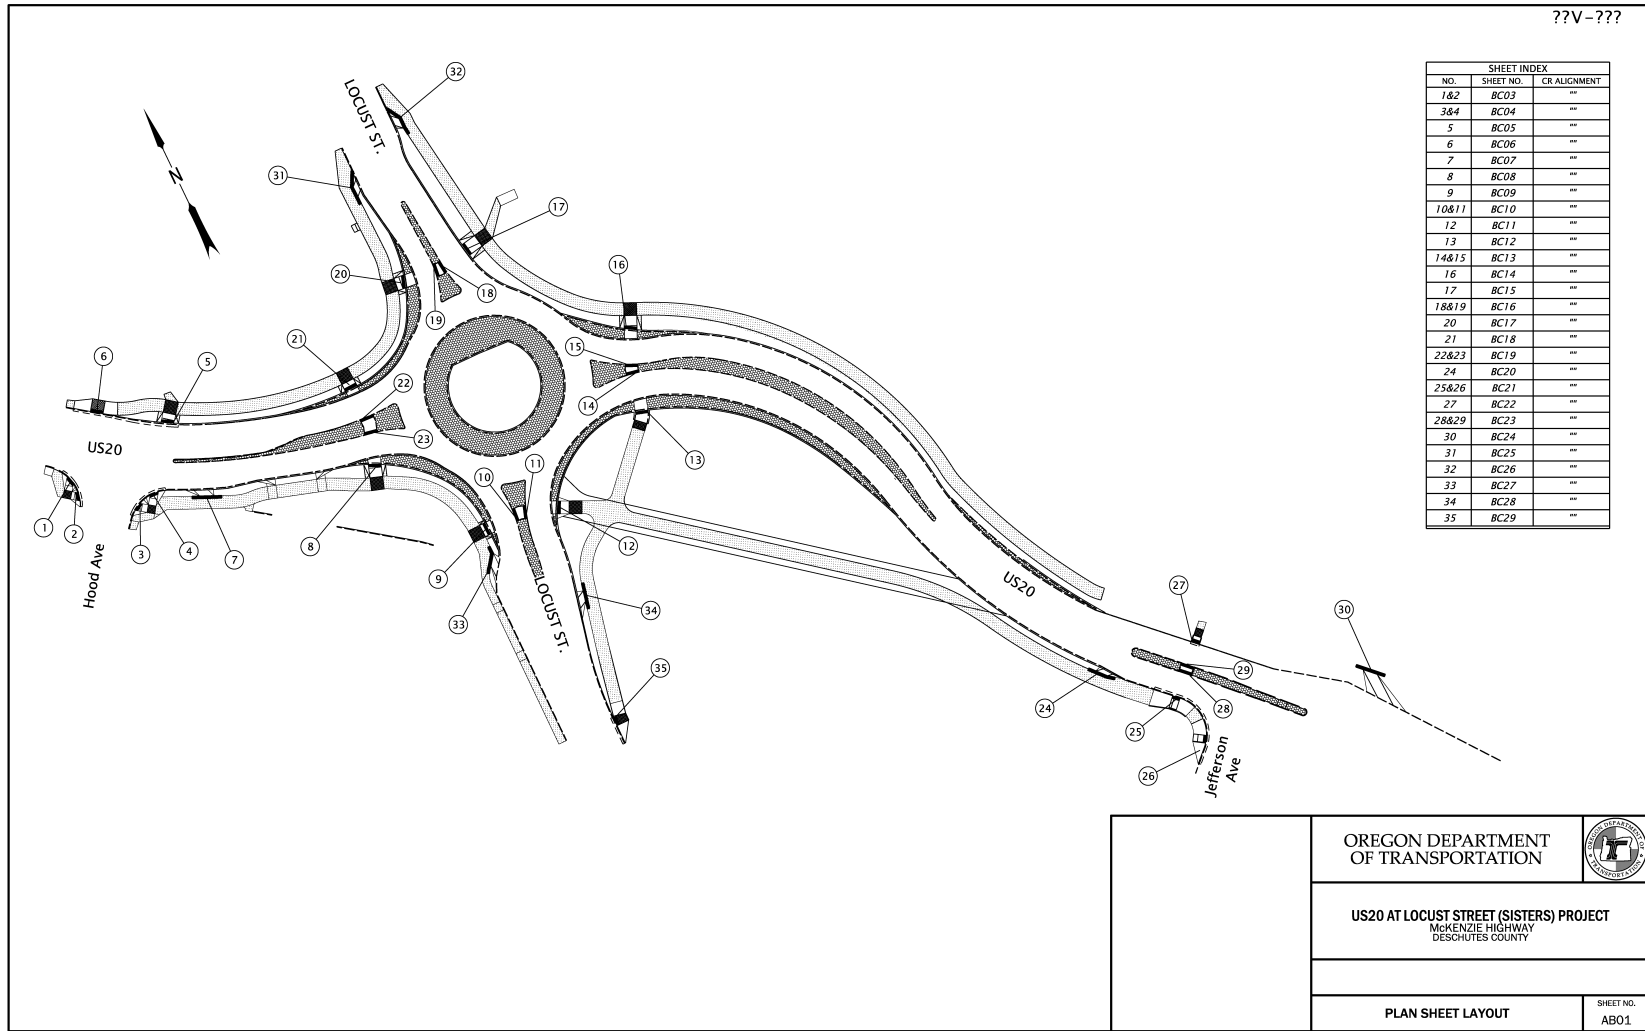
Example Curb Ramp Plan Sheet Layout – Control Lines
